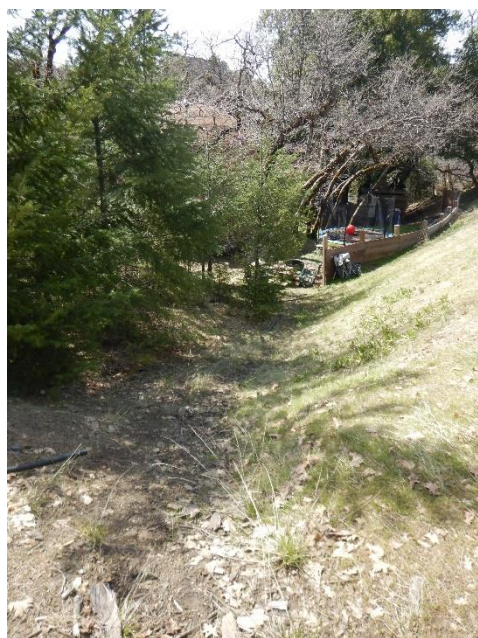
Channel upstream of structure upstream of C2, pond P1 dam on right side of channel
